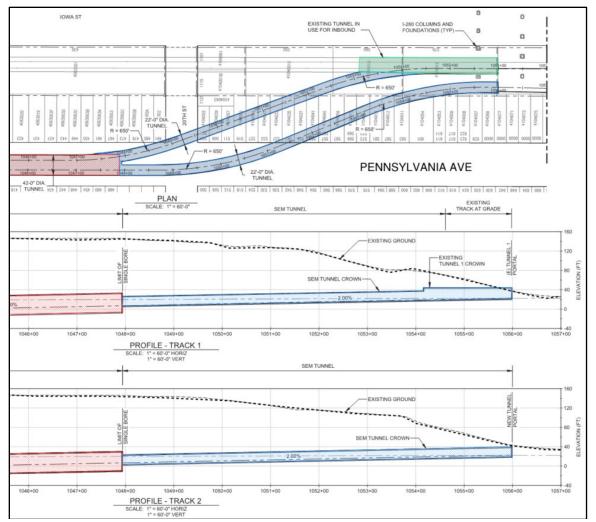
Plan and Profile of the SEM-mined Connections from the South End of a Single Bore Tunnel to existing Caltrain Tracks for Alternative B1
